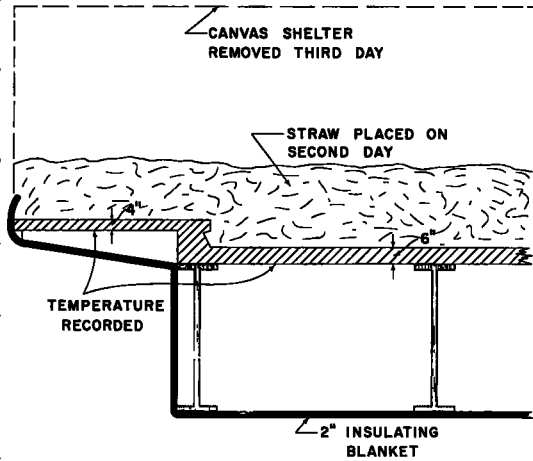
Method of insulating concrete slab poured on steel girders; Bad River bridge, Ft. Pierre, South Dakota.
